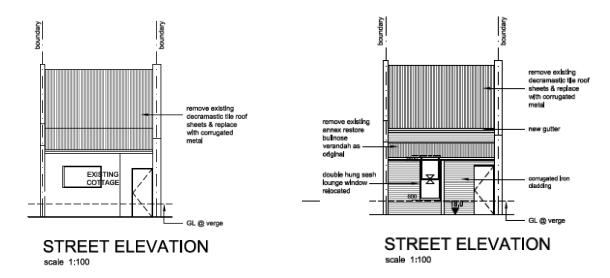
Bellevue Terrace elevation of Refused development (Left) and Deferred Plans (Right).
